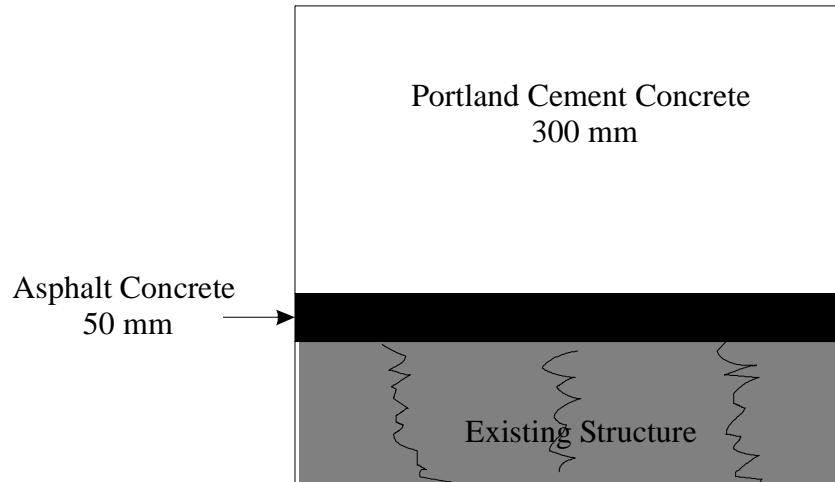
Rigid pavement structure proposed by Yellow team for areas with sufficient subgrade support.
